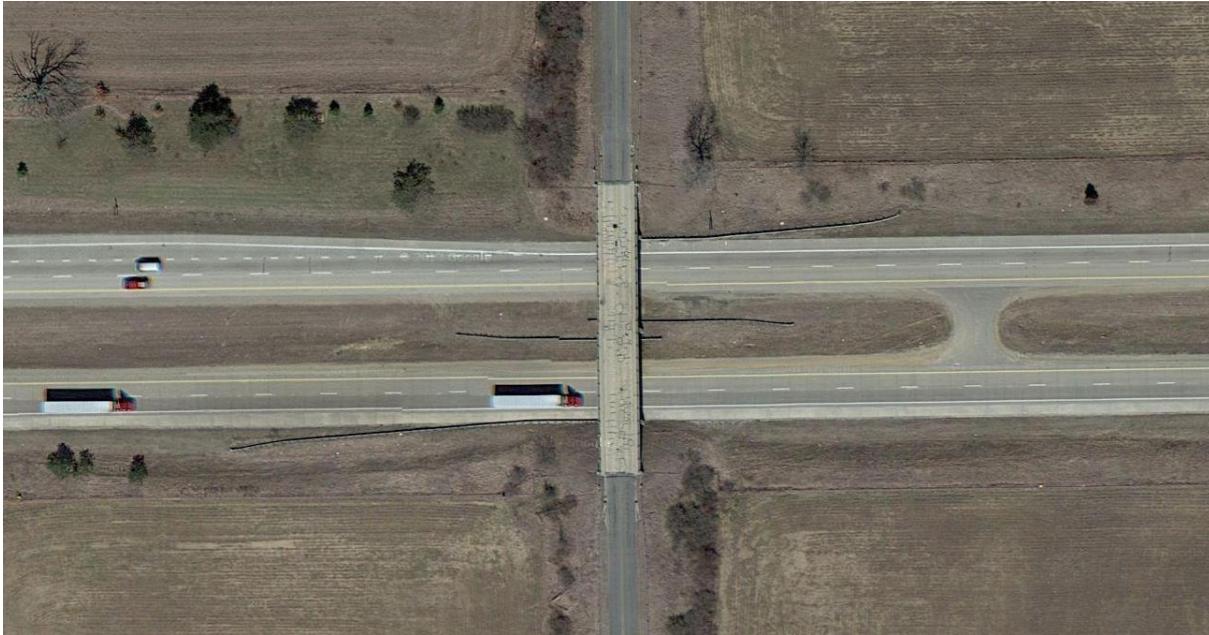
20 Mile Road Bridge over I-94 Located in Calhoun County, Michigan.
